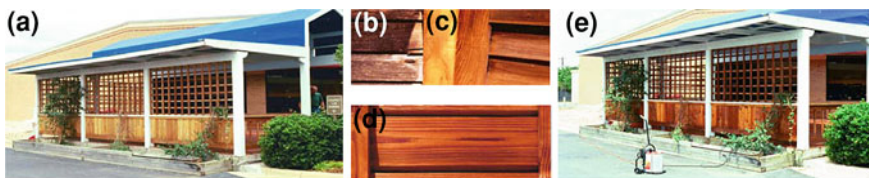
a Building-façade after cleaning and dry; b before; c after-dry; d stained; e building-façade after drying, within staining process
